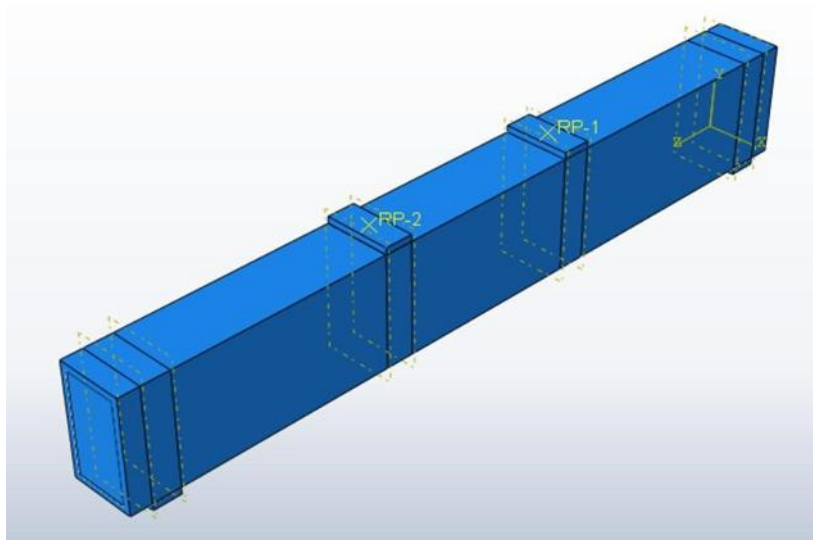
Model of a reinforced concrete beam fully reinforced with Ferrocement.
